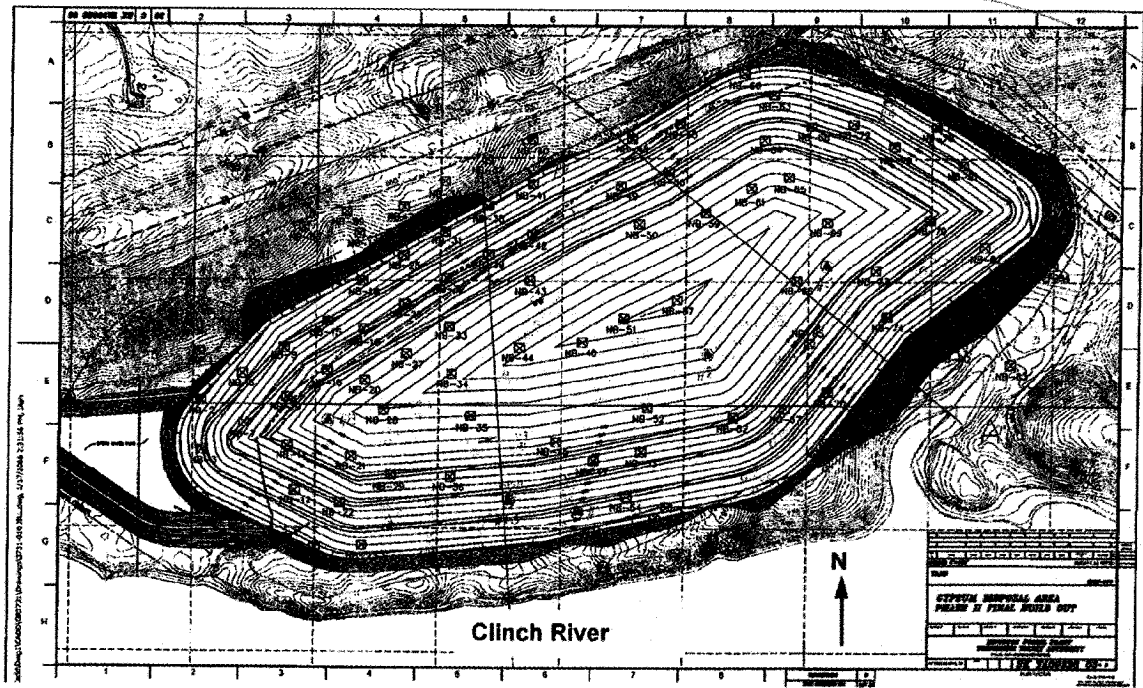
Plan View of Site at Proposed Final Grade Including Cross-Section Location A
